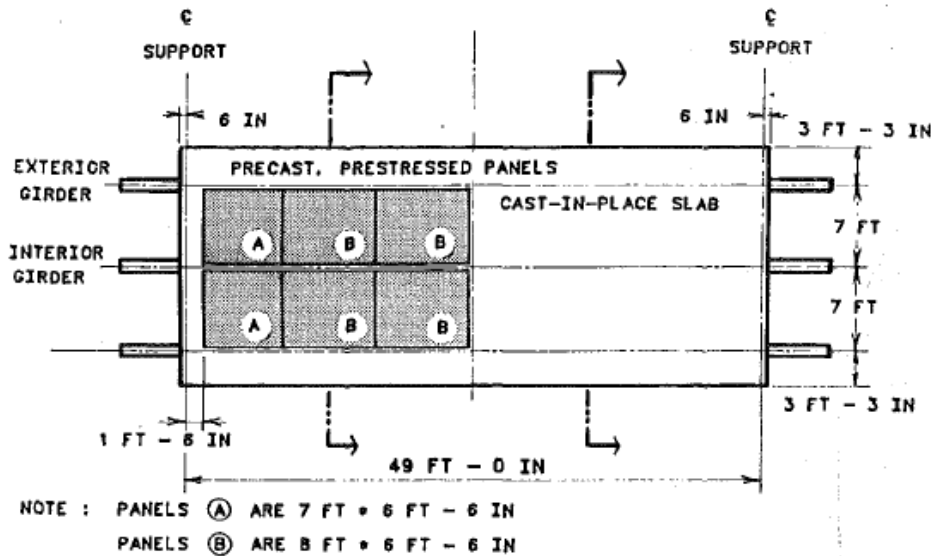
Plan View of the Test Specimen (Fang et al. 1990)
